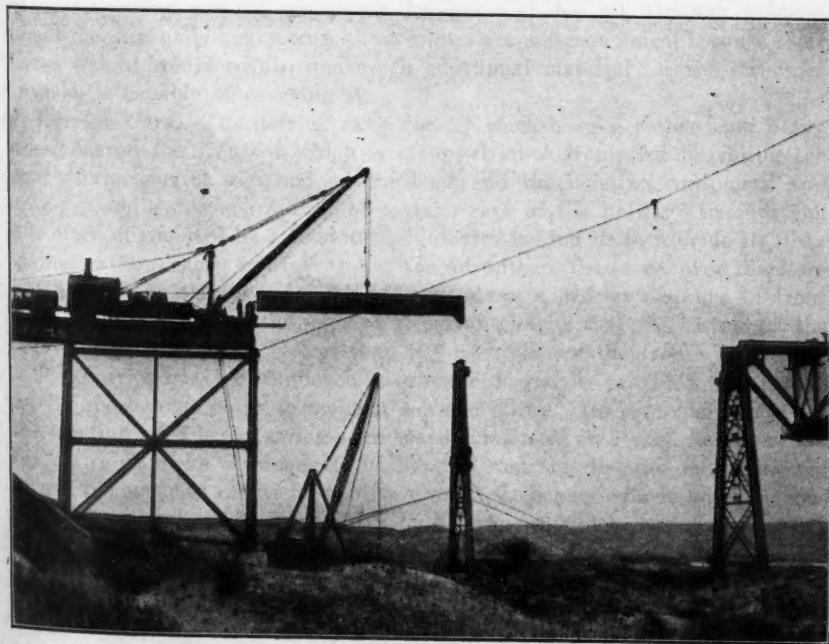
DERRICK CAR SETTING PLATE GIRDER ON BENT.
